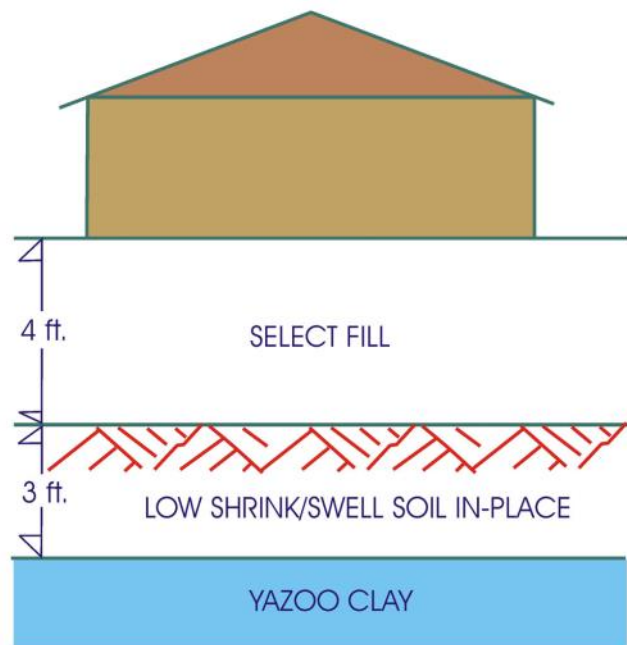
House with a slab foundation built above 4 feet of select fill added above grade on a 3-foot naturally-occurring layer of low shrink-swell soil overlying the Yazoo Clay. Image 1937, modified from Tommy Dunlap's slide presentation.
